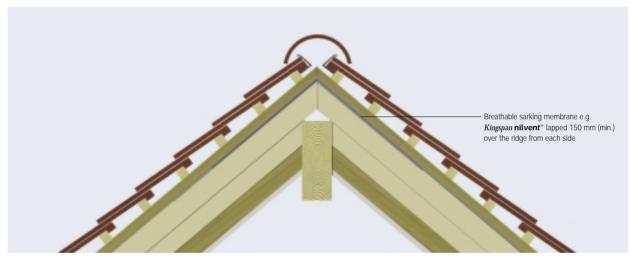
Ridge Detail - Section Perpendicular to Ridge
